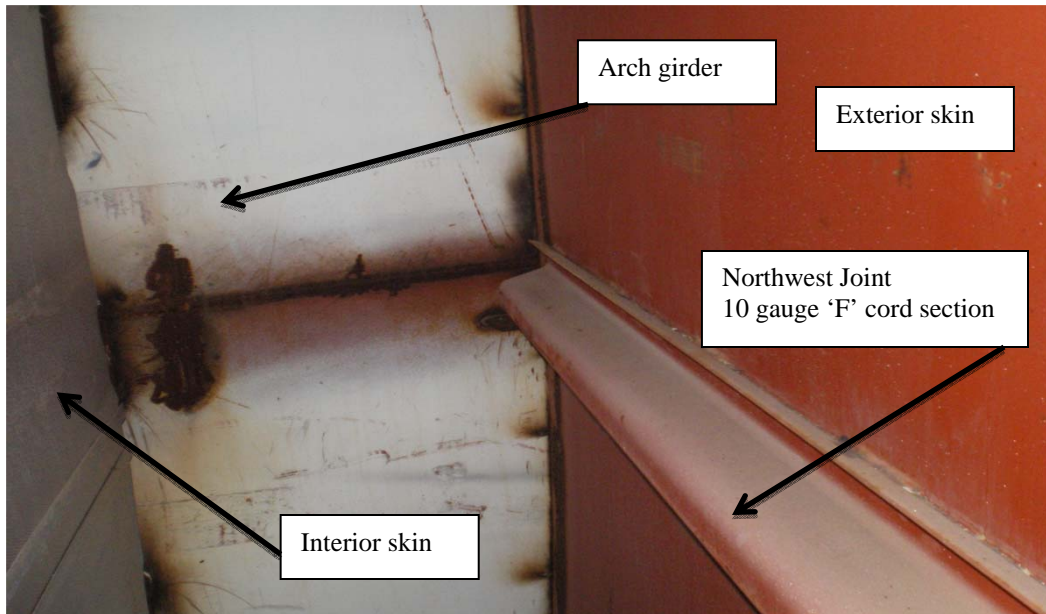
Inter-skin gap showing vertical face of arch girder and a Northwest Joint 'F' chord section
